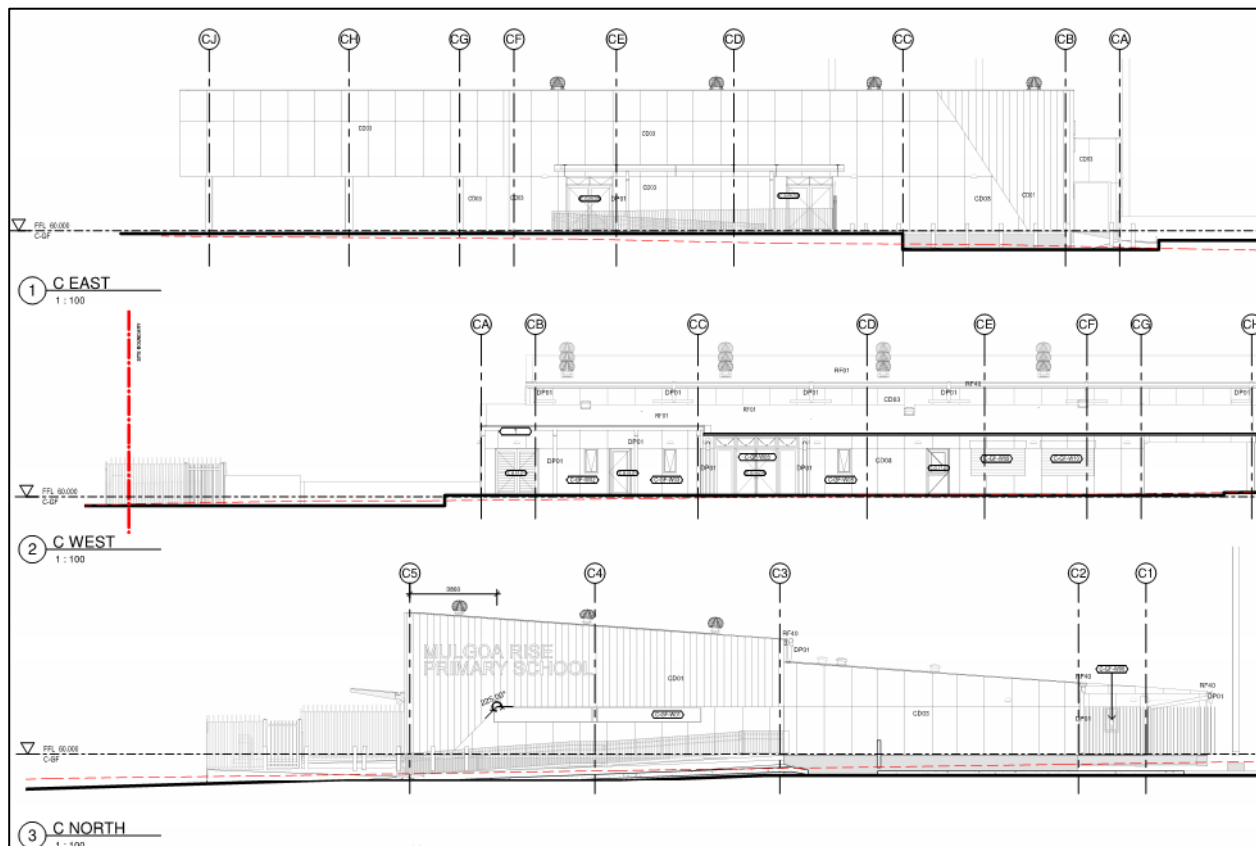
Building C Hall with vertical HiLand wall cladding to upper parts and corner.
